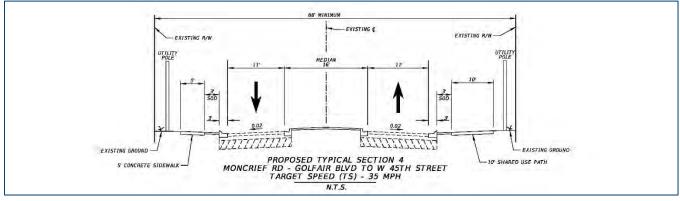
Proposed Typical Section (Golfair Boulevard to W. 45<sup>th</sup> Street)
